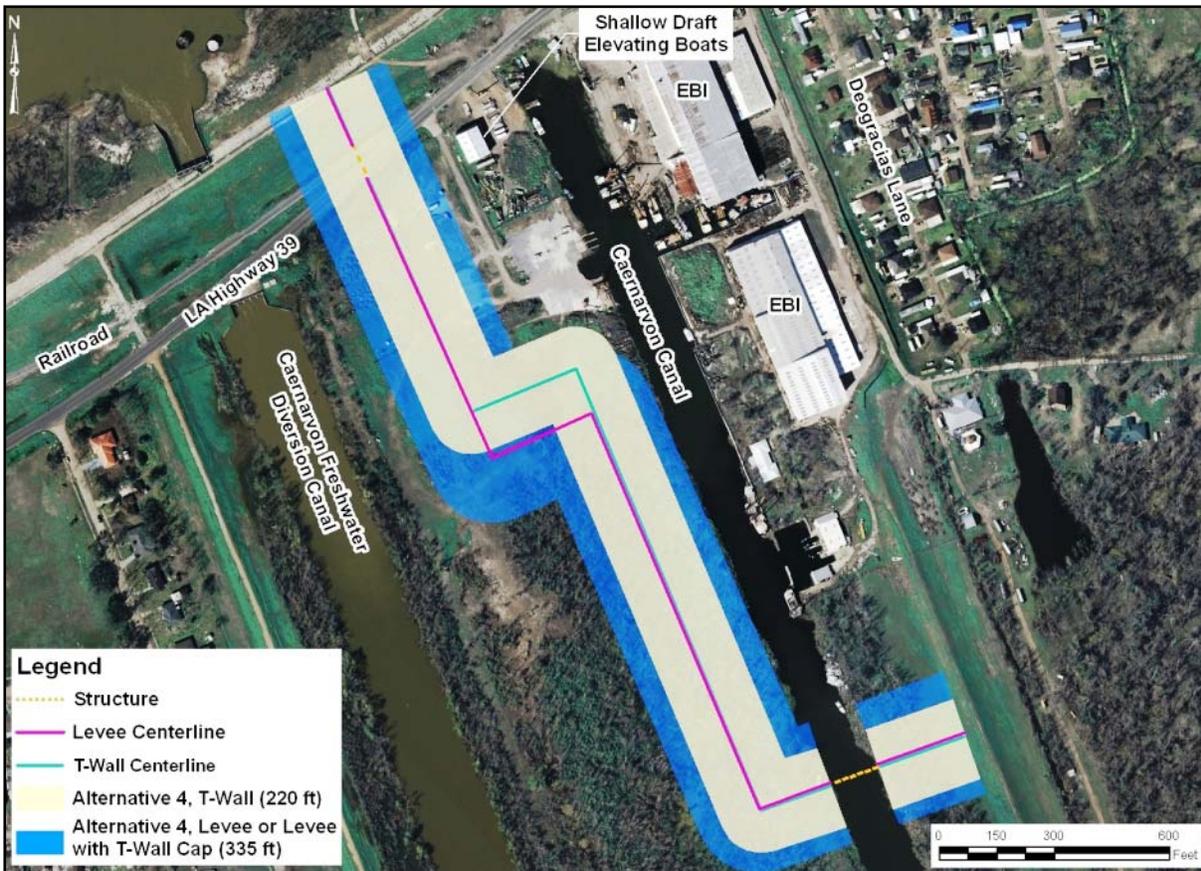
Alternative 4 - Realignment of Caernarvon Floodwall to West of SDEB Property (Zigzag Configuration)
